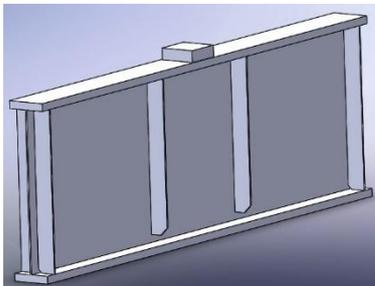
Plate Girder with two stiffeners spaced at 182 mm each side of web and centered on point of load application
